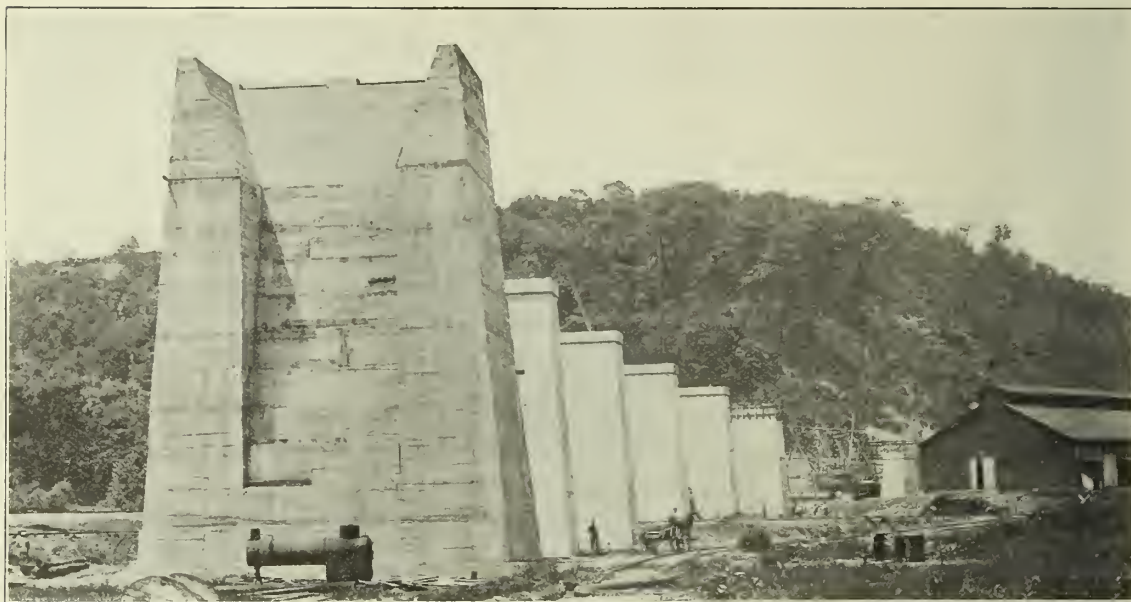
Masonry for Bridge at Station 820, Looking West.
